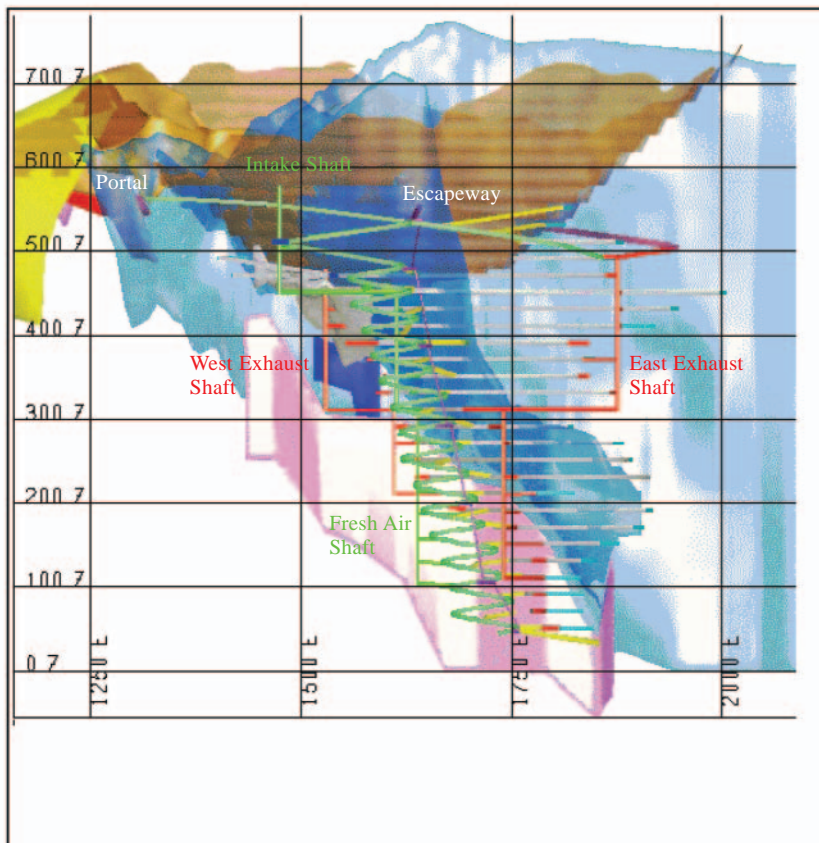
Jinfeng Underground Mine Access and Ventilation Layout
